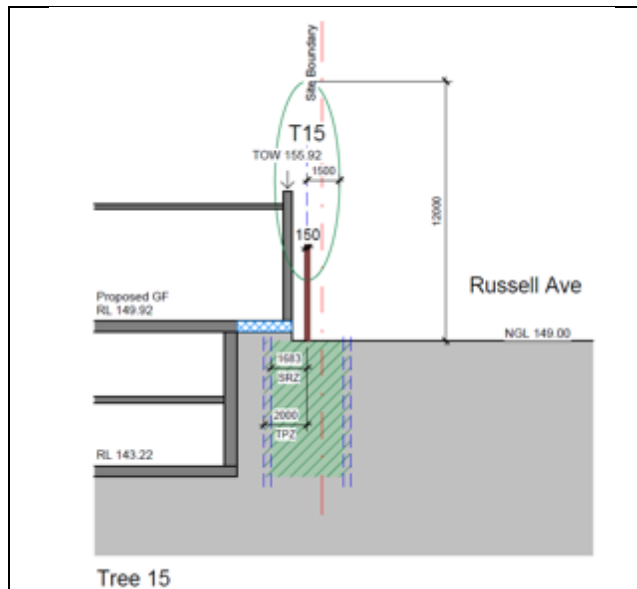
Cross section Tree 15 – construction works including a suspended slab (couter level) retain existing soil level.
